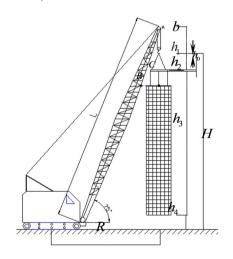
Reinforcement cage lifting by crane 图 3. 钢筋笼吊装示意图
